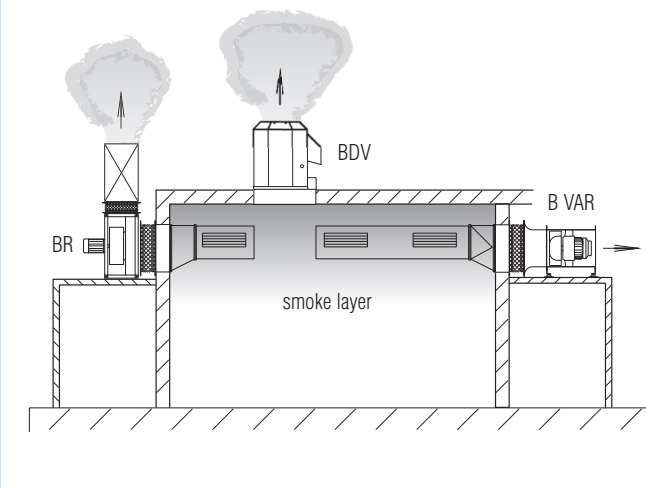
Fan outside of the smoke section, inside of buildings in sufficiently ventilated room.
